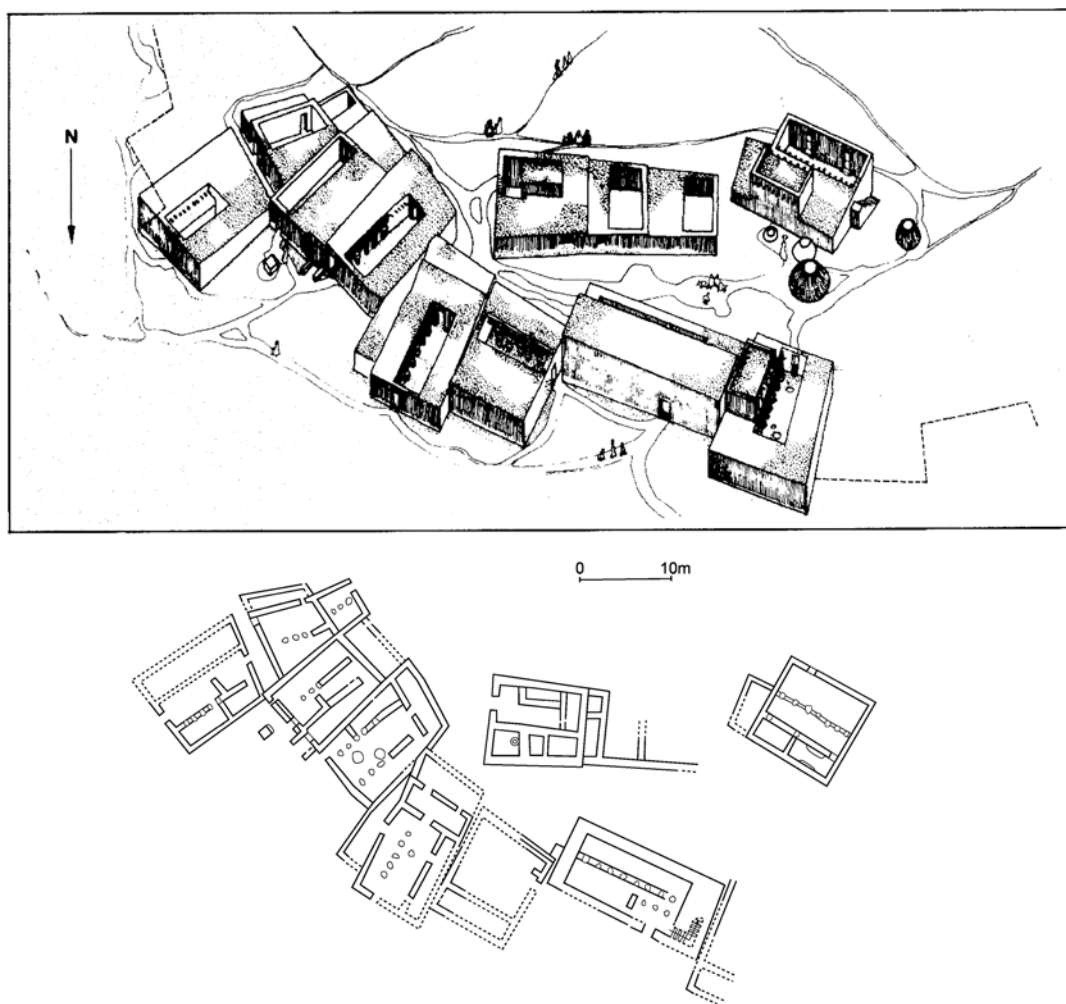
Layout of Early Iron I structures at Tell Masos reconstructed with open, unroofed center courtyards.
